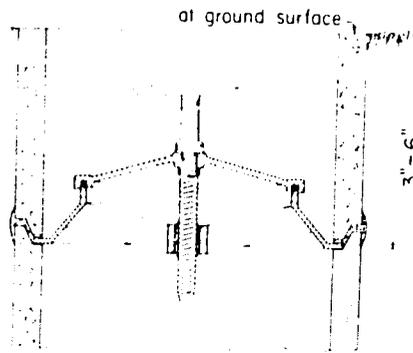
Orchard valve hydrant showing the recommended installation of the valve in the riser (4).
